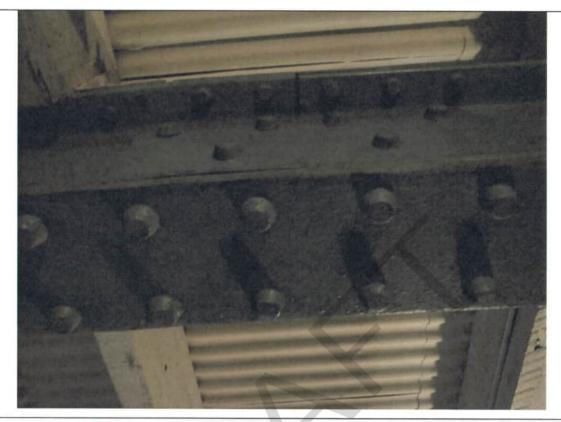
Steel splice plate on beam supporting bleachers, showing rivets
